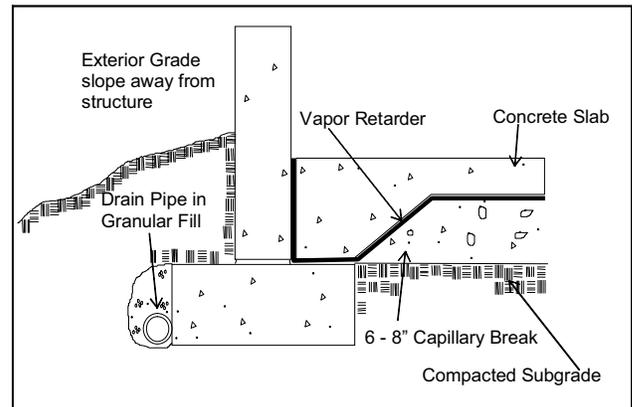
Typical Detail of Slab on Grade with Vapor Retarder
